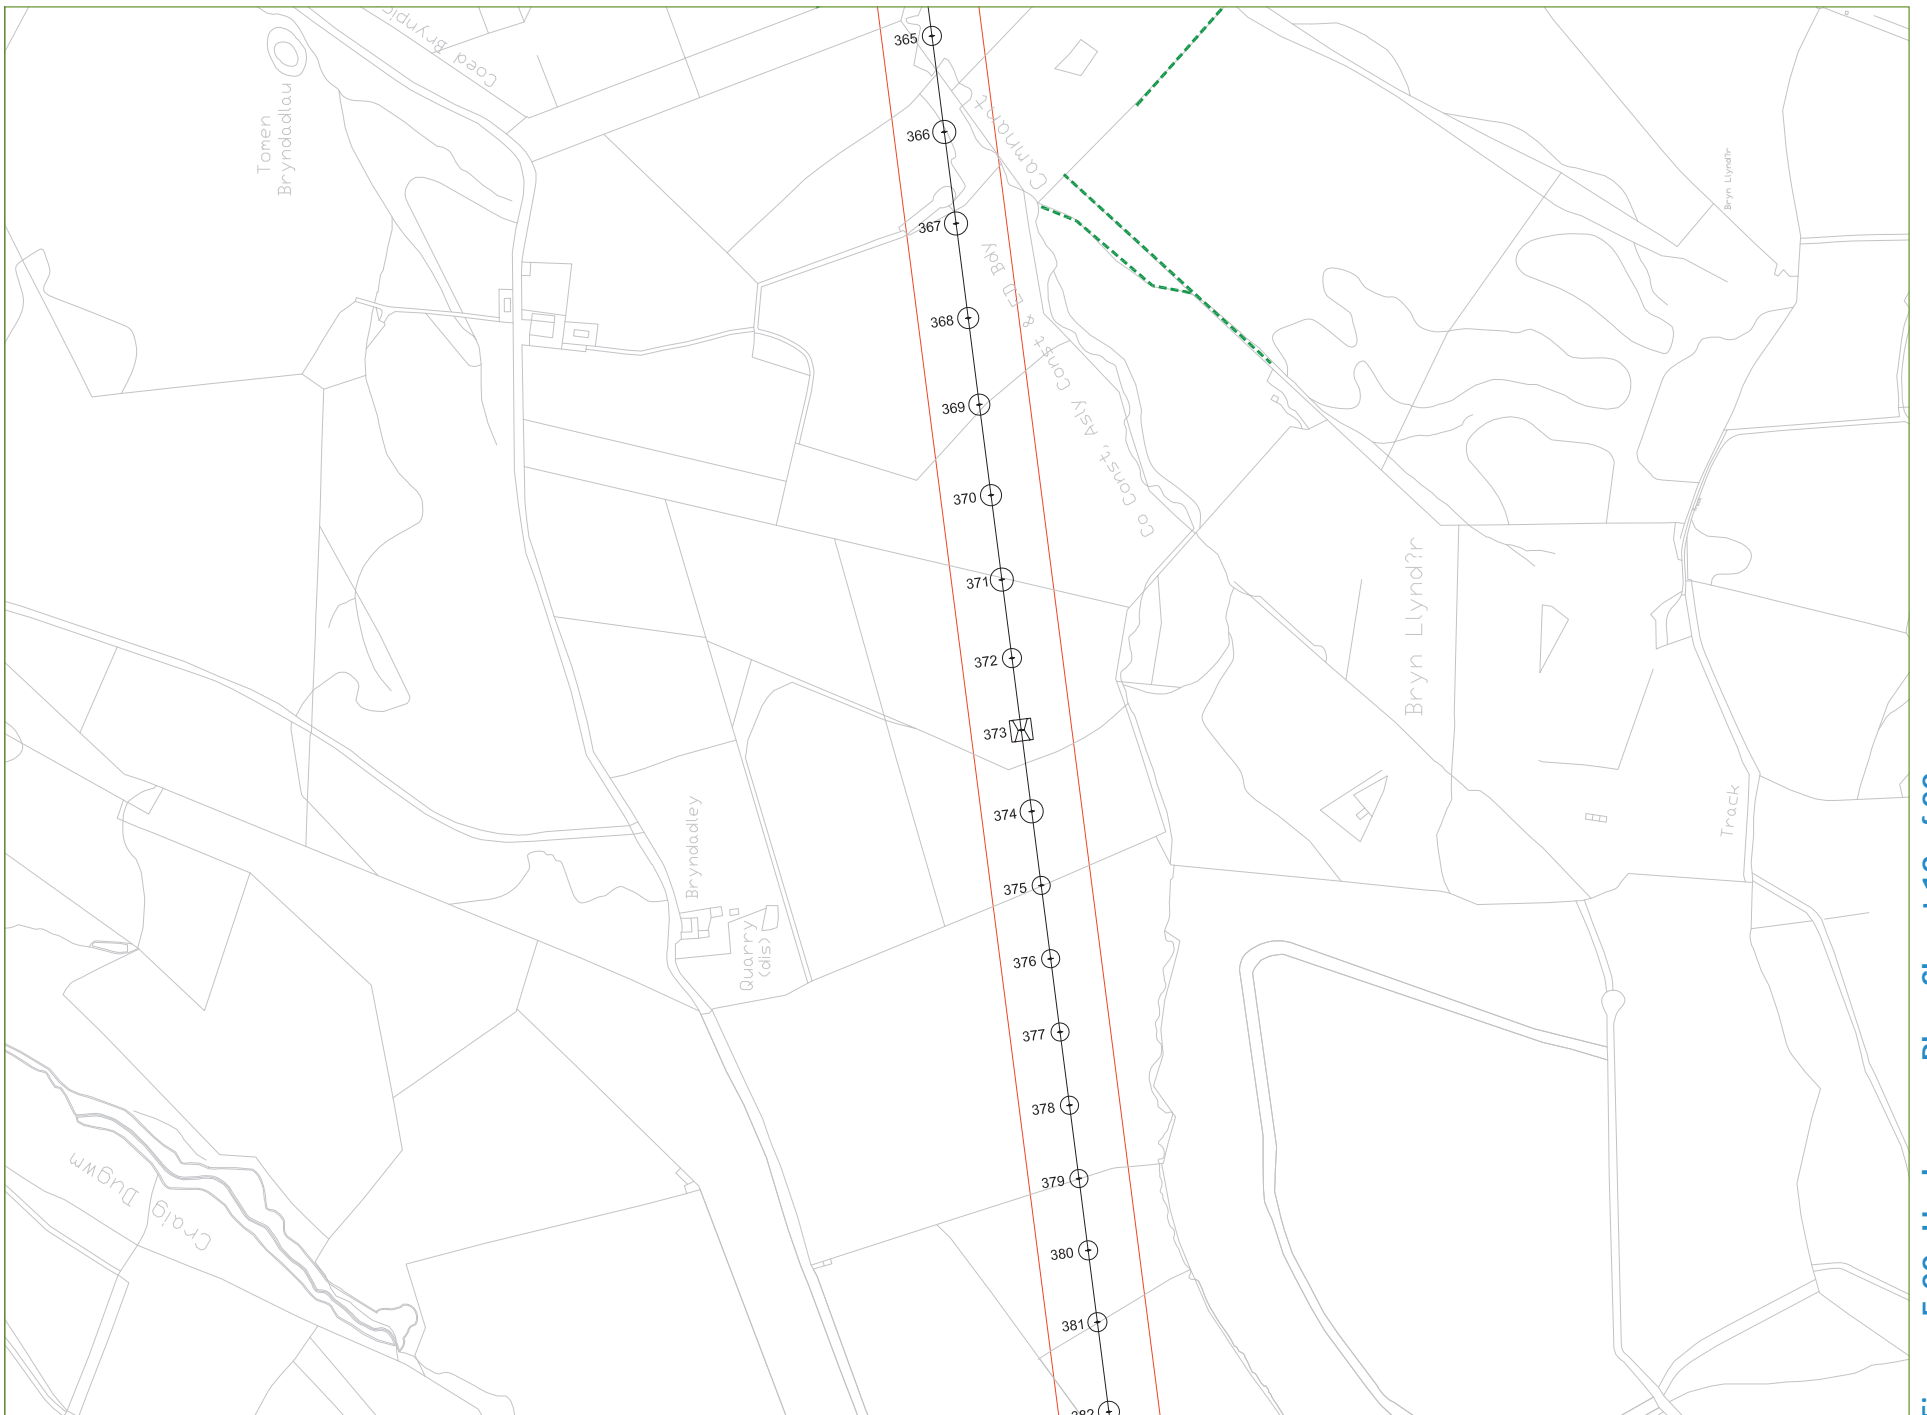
Hedgerow Plan Sheet 19 of 20
